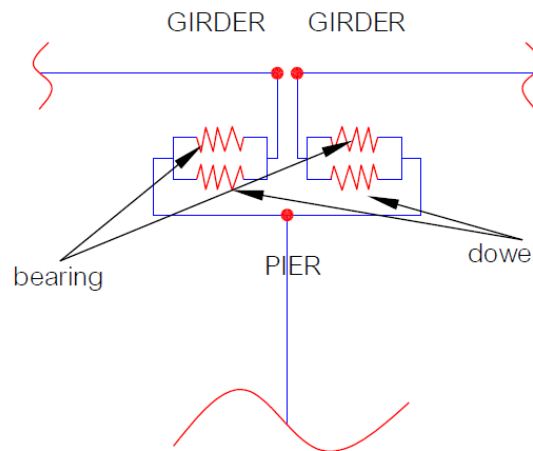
Structural modeling of elastomeric bearing and shear dowel connected to the structural elements
